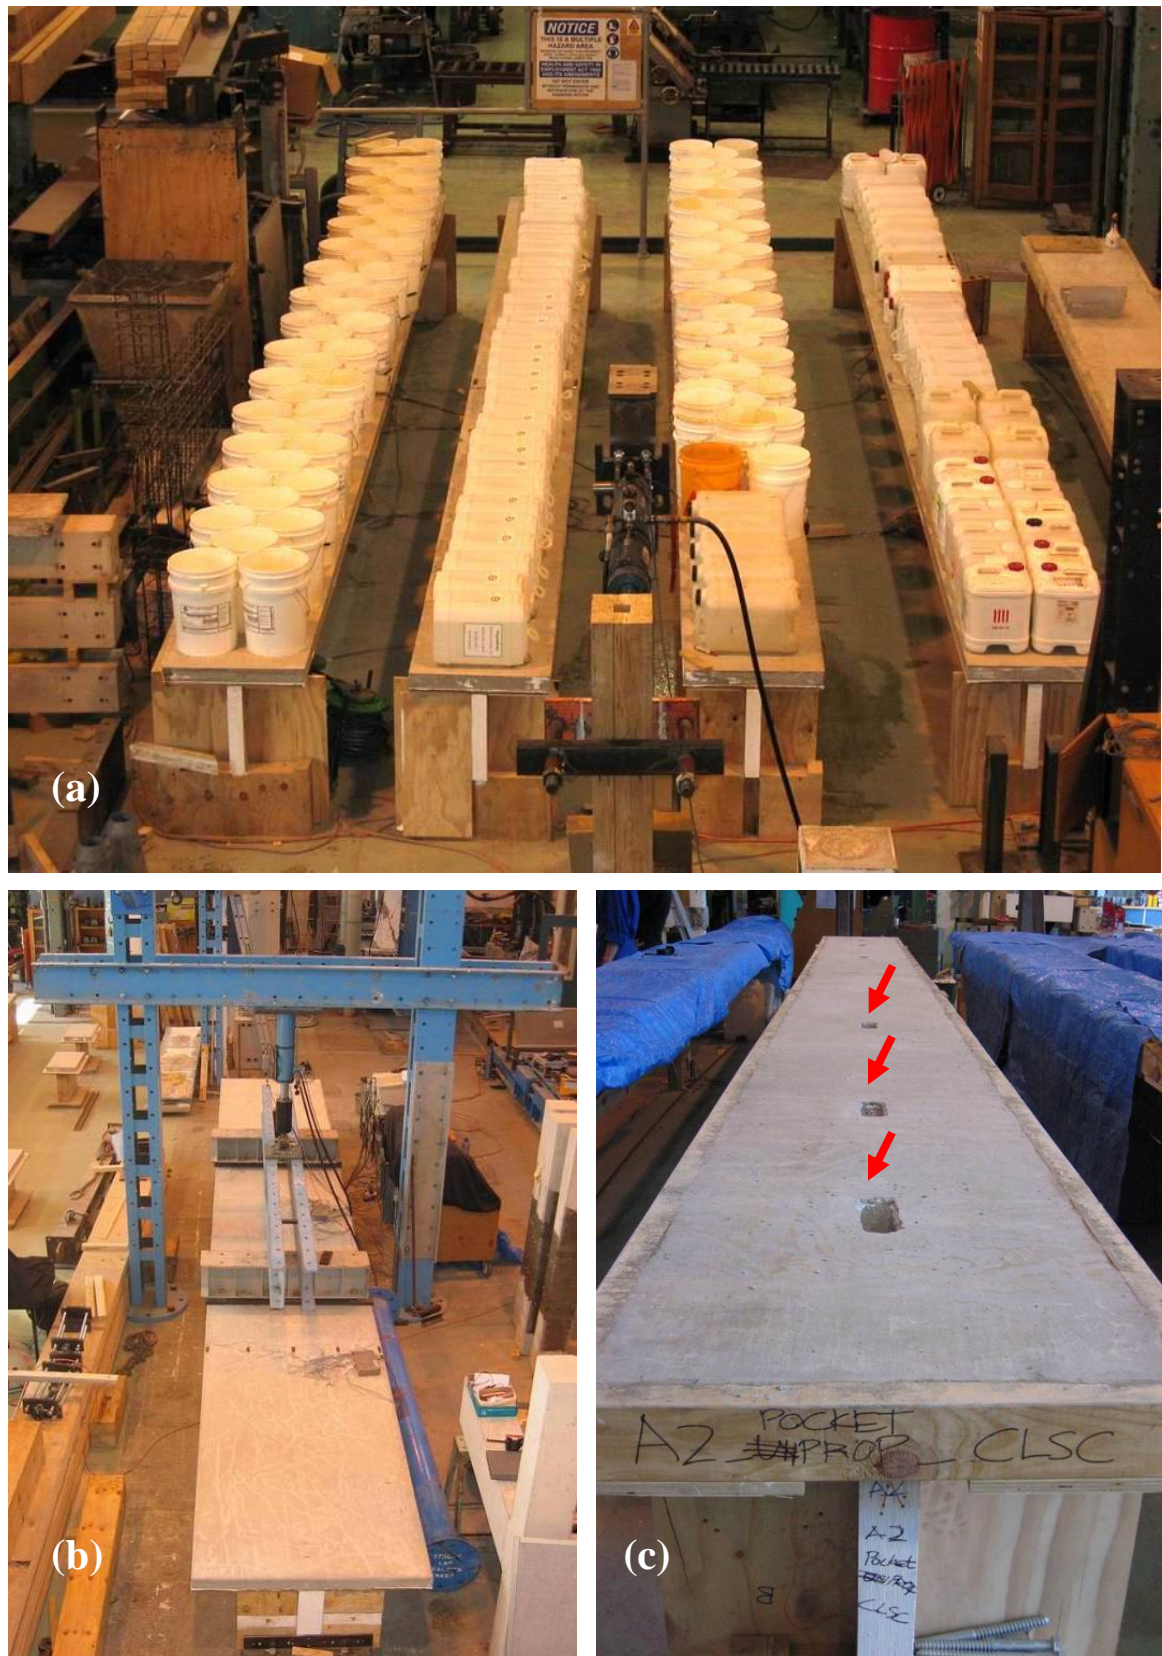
Full scale TCC T-beams at the University of Canterbury, (a) 4 beams under service loads using buckets of water, (b) An 8 m beam 1200 mm width ready for collapse test at 4 point bending, and (c) Arrows pointing to connection pockets in beam
